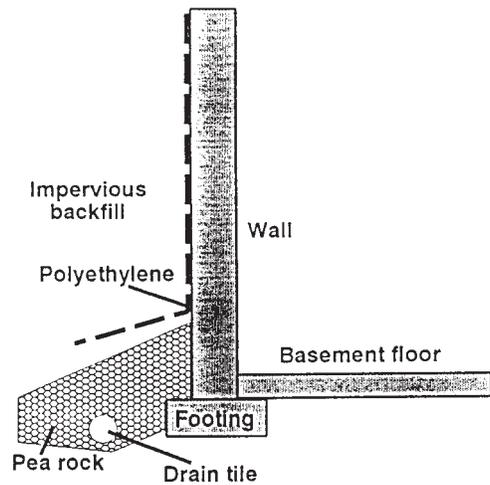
Cross section of basement wall and floor when retrofitting from the outside of the basement wall.
